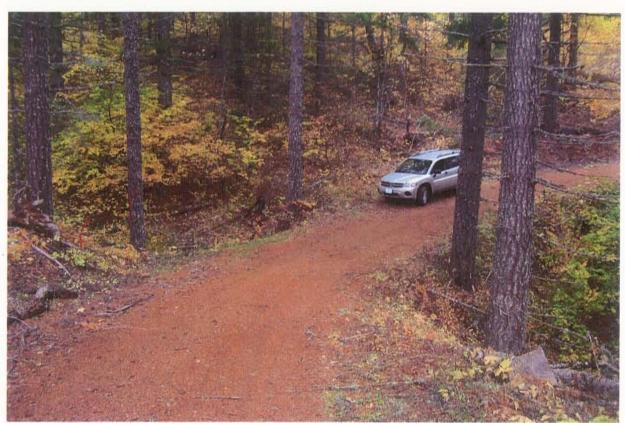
Looking north at location of USGS and DNR-mapped stream. Drainageway is in front of vehicle. 10/26/06.
